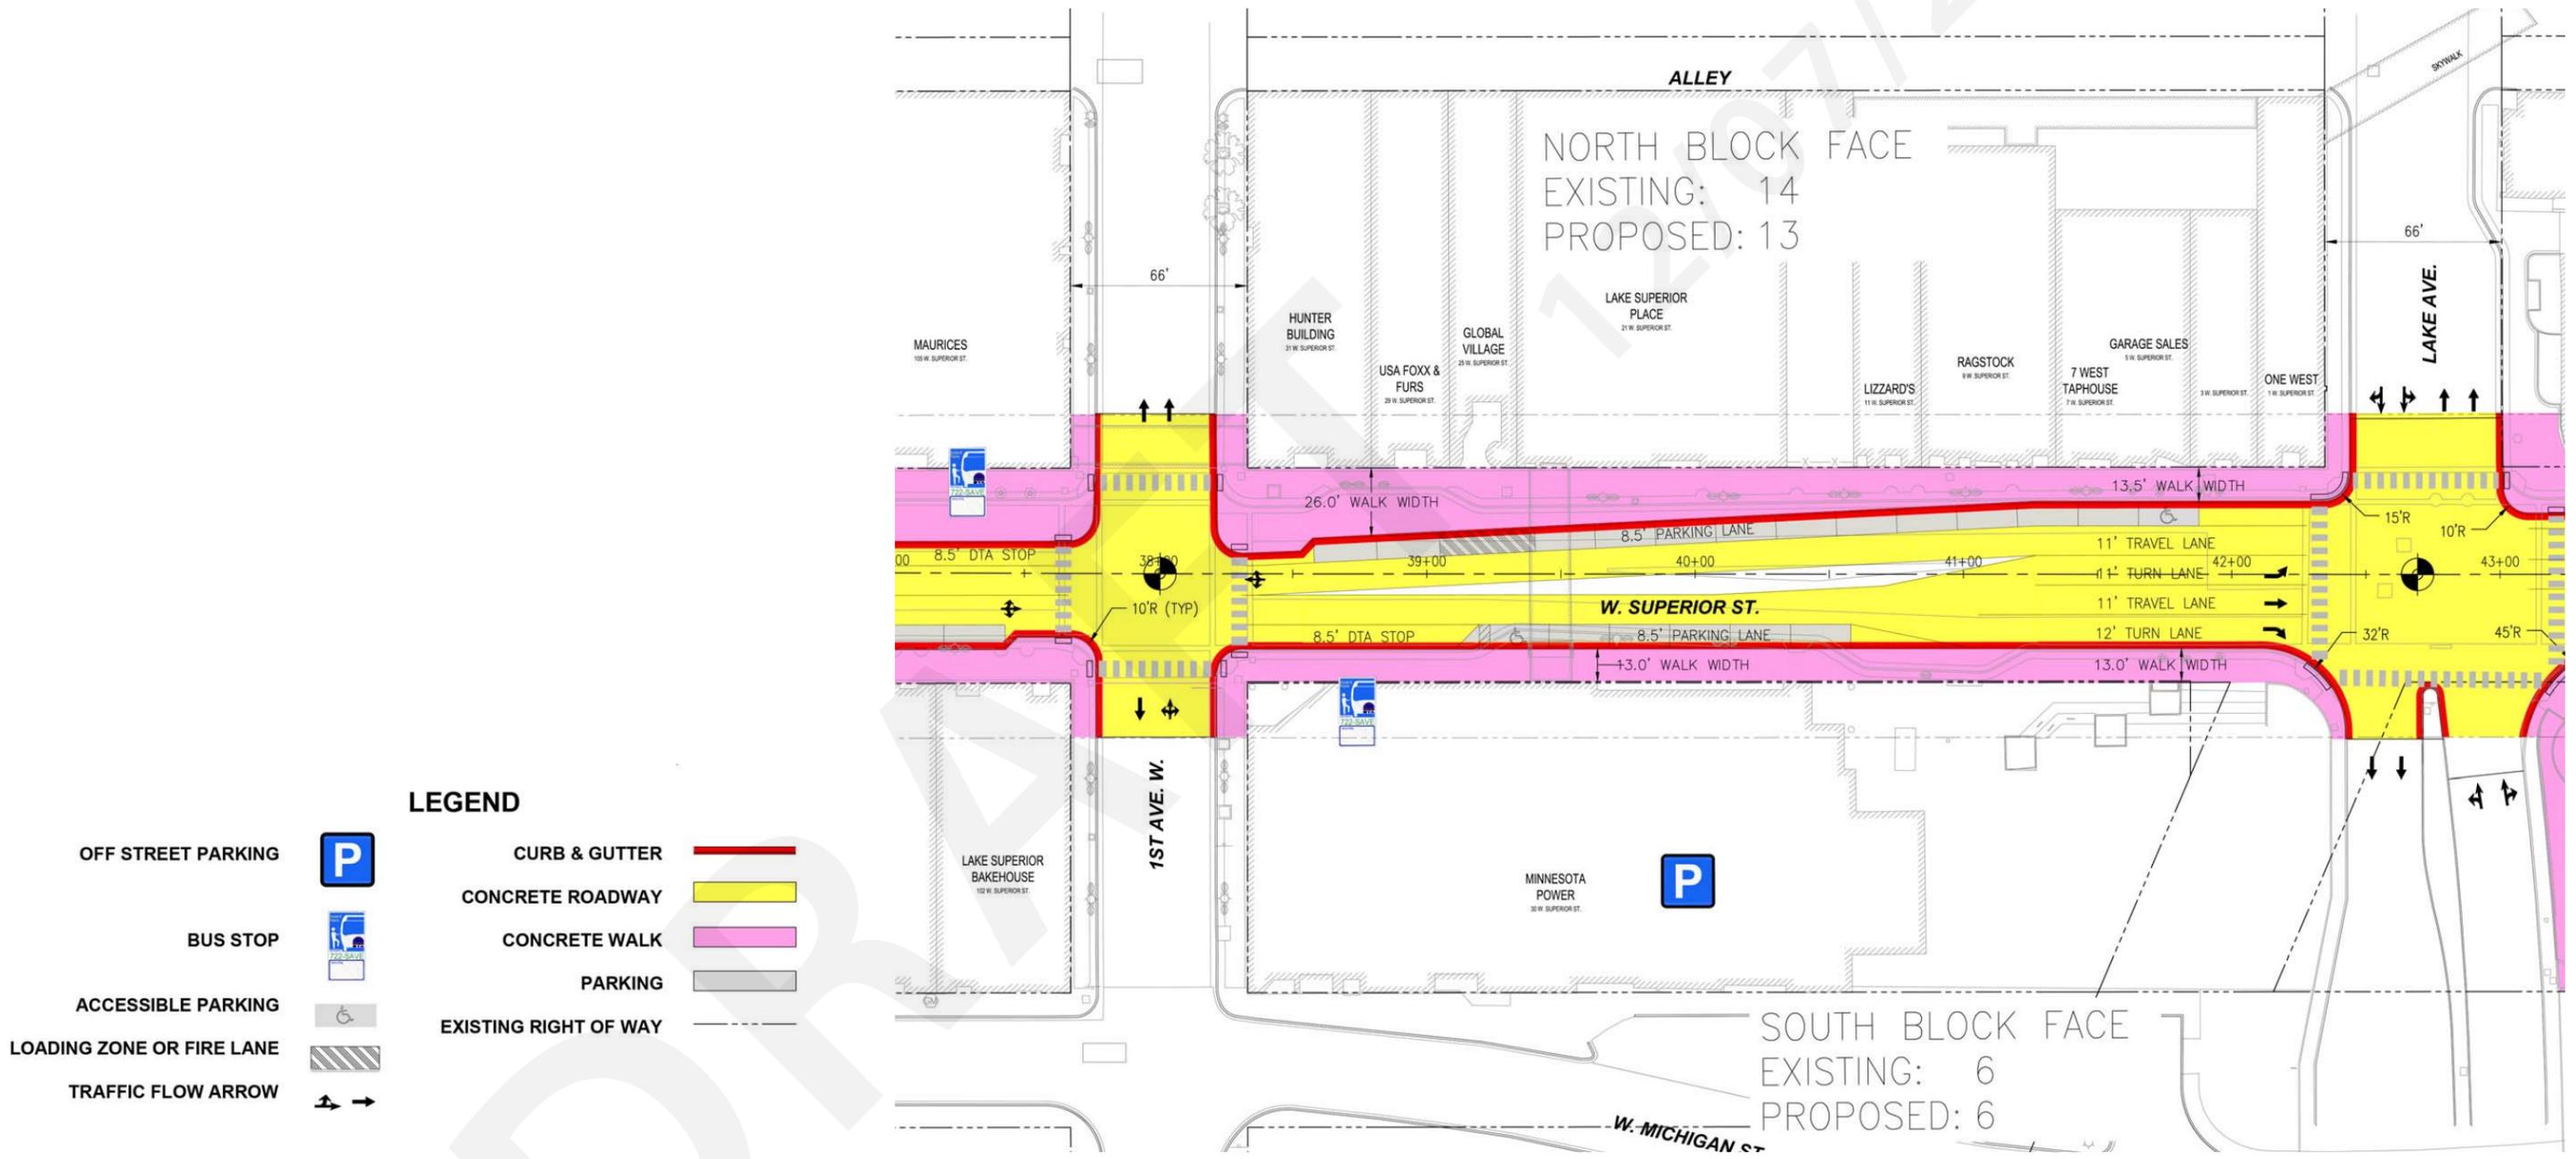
Proposed street layout between 1st Avenue West and Lake Avenue.
